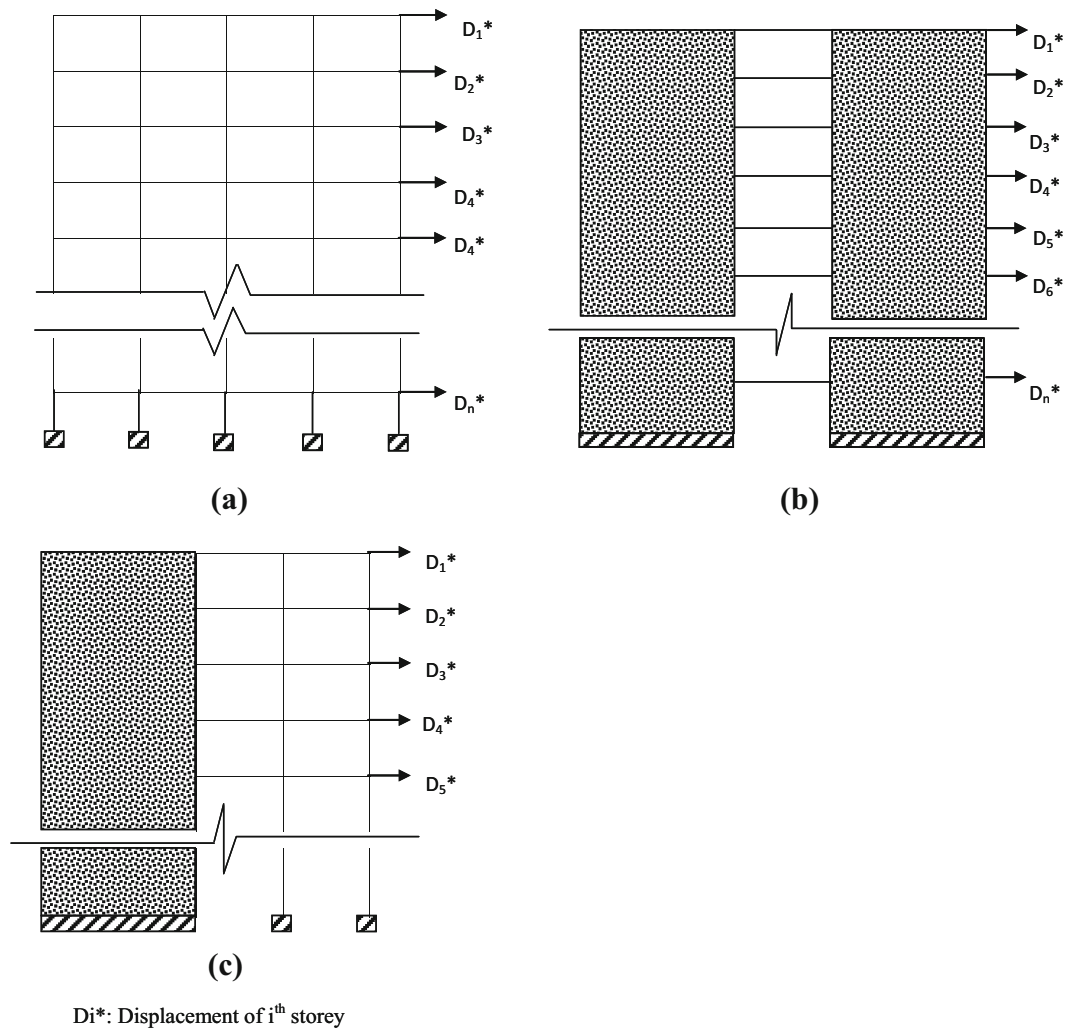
Considered planar frames in the analysis of three dimension and geometrical symmetry: a concrete moment resistance frame; b symmetric concrete shear walls; c asymmetric concrete shear wall (Ghali et al. 2003)
